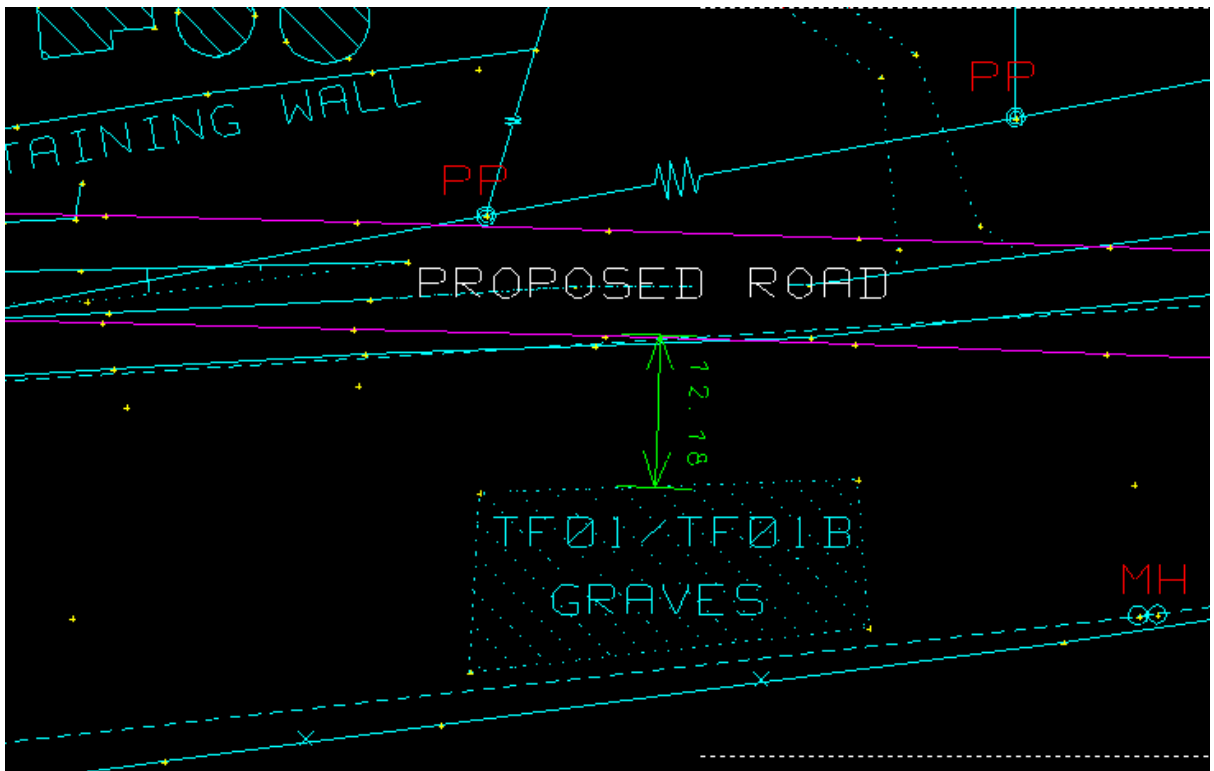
Position of grave site TF01 adjacent to the new road alignment (Source: Neil Brand)
